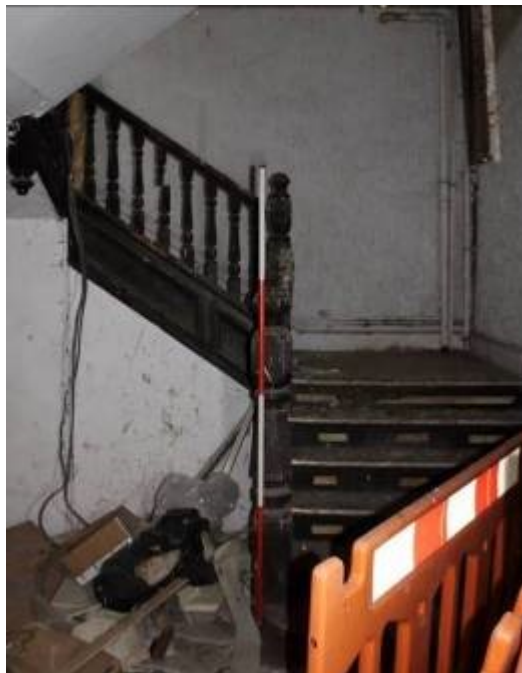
Southeast facing shot of the foot of the main stairs. 2m scale.
